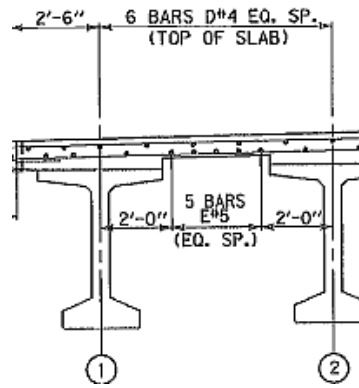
Deck Reinforcement Configuration between Interior Girders
